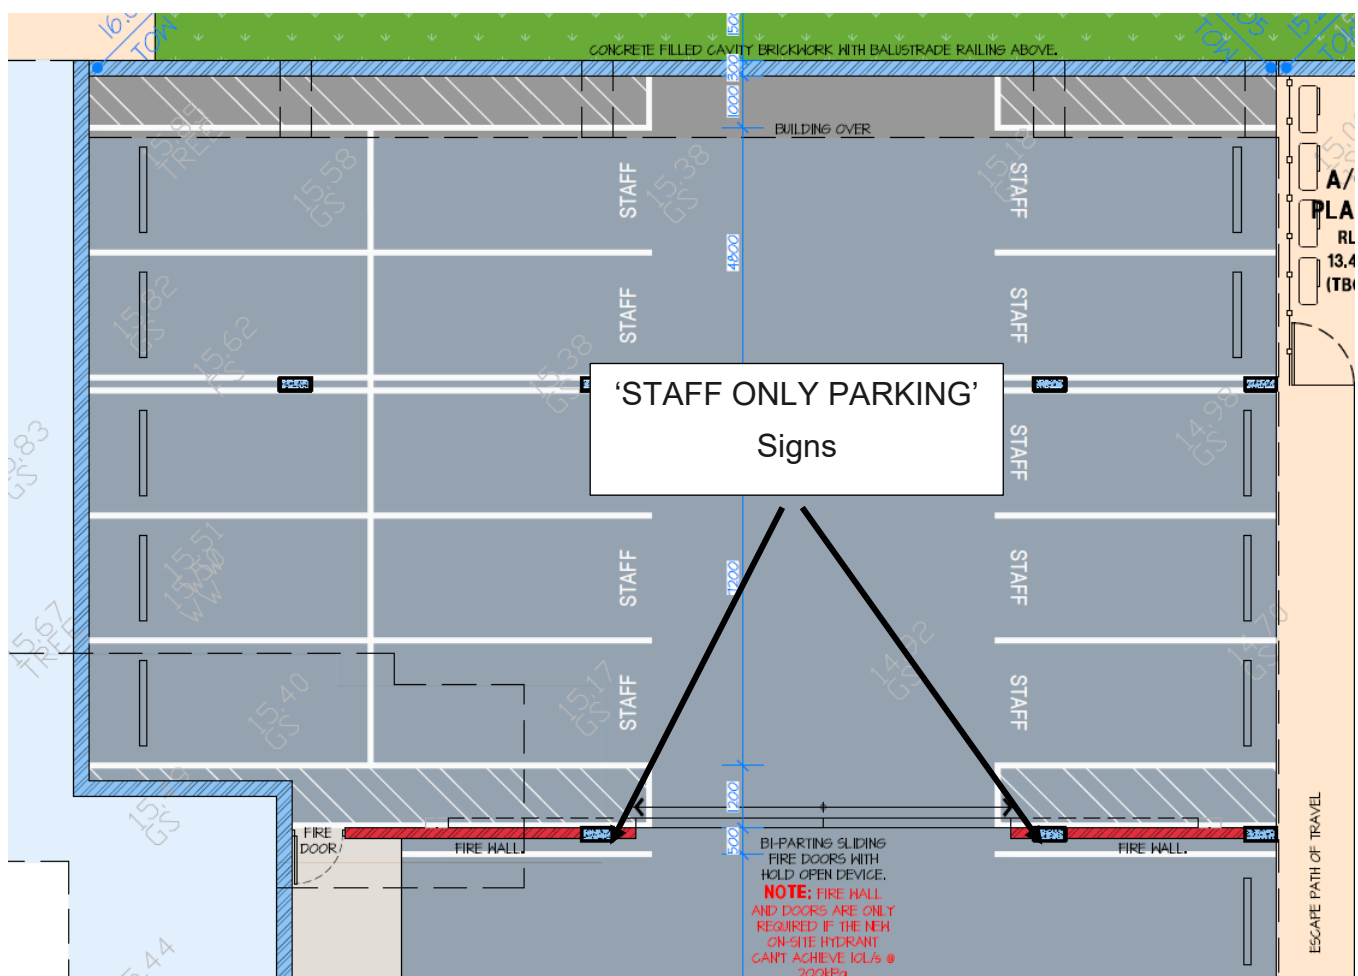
Recommended 'STAFF ONLY PARKING' signs
